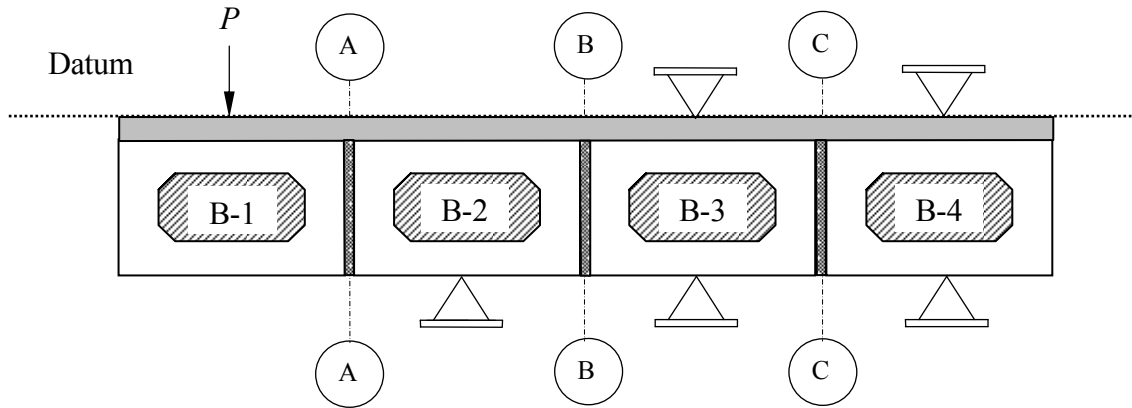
Loading arrangements for cracking the exterior shear-key A-A.
